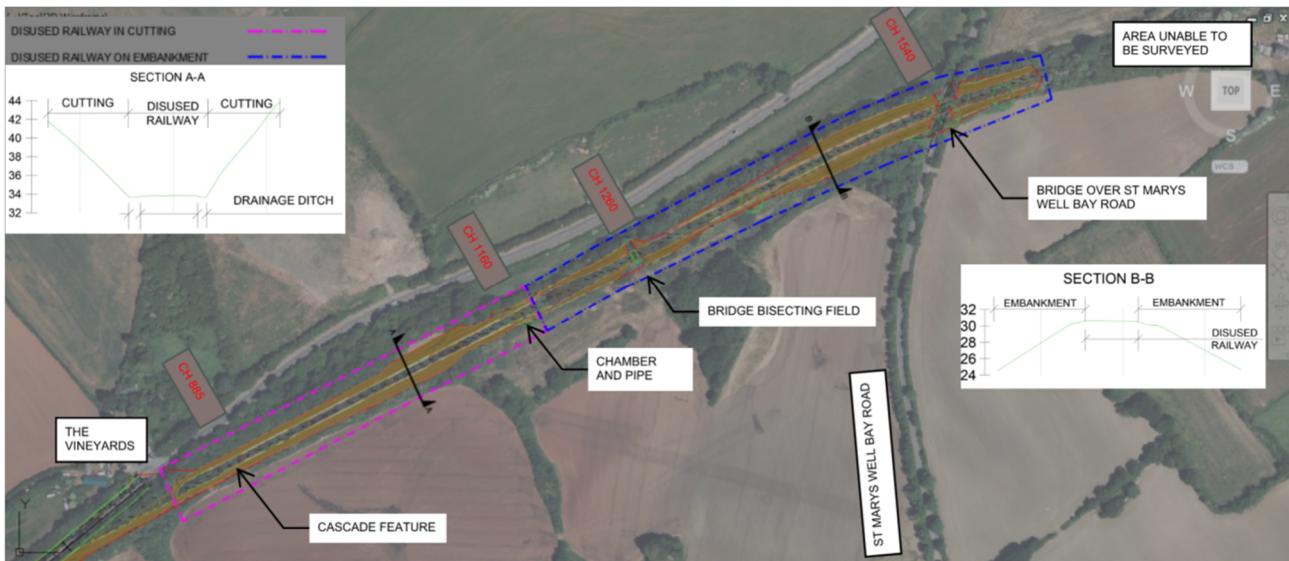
Southern Section of Disused Railway - Cutting and Embankment Location
